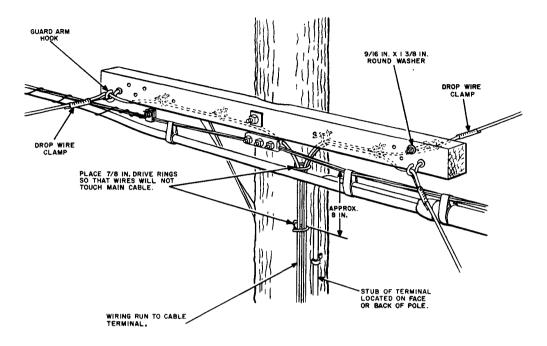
Cable Terminal Mounted on Face or Back of Pole
